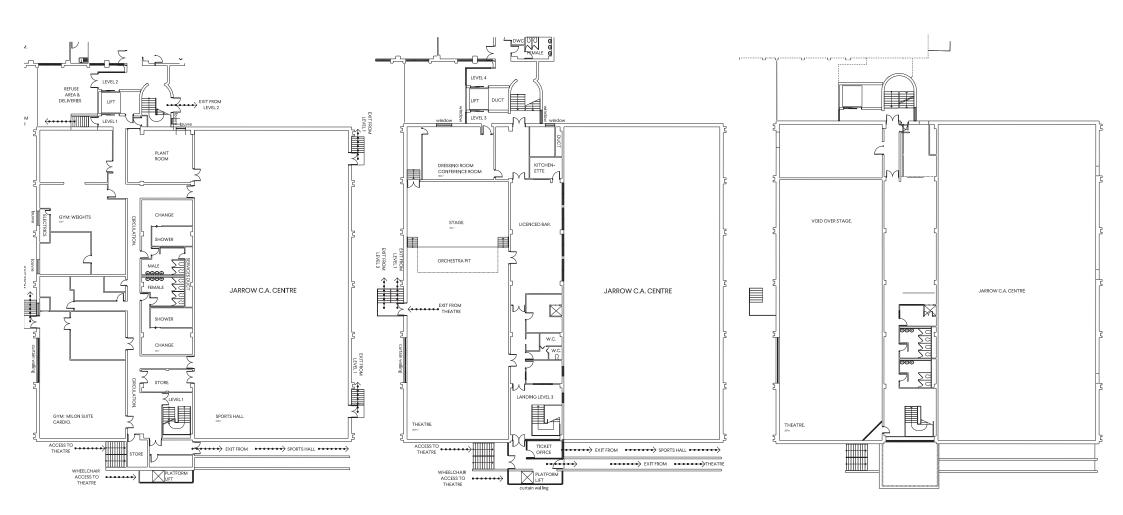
Ground, First, and Second Floor Plan as existing
